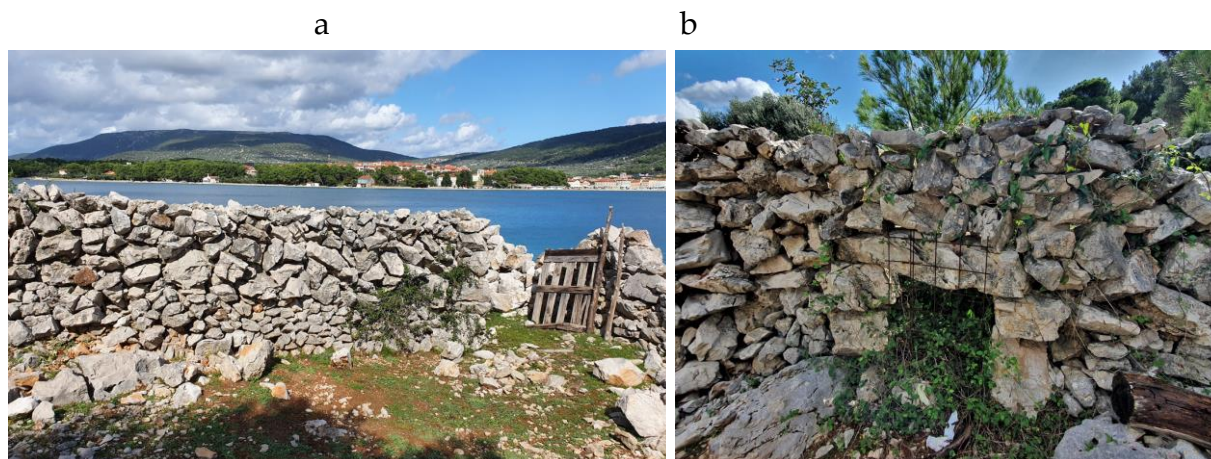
Dry stone details of the multicellular sheepfold of Dražica. a) The dry stone walling here is done in a combined manner (i.e. the 'Galloway wall' method); the lower part is constructed with double walls, and the upper part is constructed with a single wall. b) The lunky hole served as an entrance/exit of przgar (2020).
